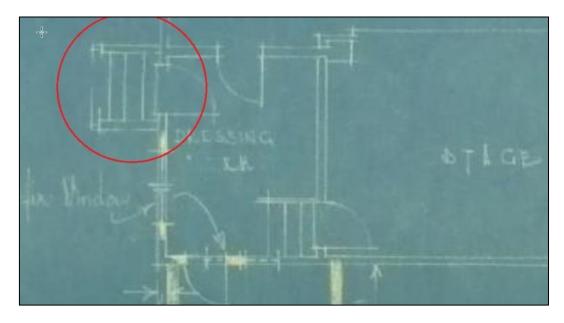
Extract from 1940 Toilet Block addition Plan (showing the dressing room, as part of the original building) – Door and steps circled in red removed – jointer outline see above in figure 81. Hobsonville air base 1938-1941 BBAD 1054 2154b [Archives New Zealand/Te Rua Mahara o te Kawanatanga, Auckland Regional Office - ex New Zealand Heritage List/Rārangi Kōrero – Report for a Historic Place Royal New Zealand Air Force (RNZAF) Institute Building (Former), HOBSONVILLE POINT (List No. 9710, Category 2)].
